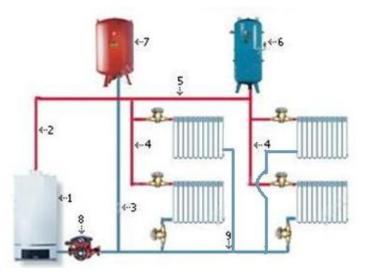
Single pipe hot water heating scheme. 1 - boiler; 2 - main riser; 3 - expansion pipe; 4 - return riser; 5 - overhead distribution; 6 - air collector; 7 - expansion tank; 8 - circulation pump; 9 - return line.
